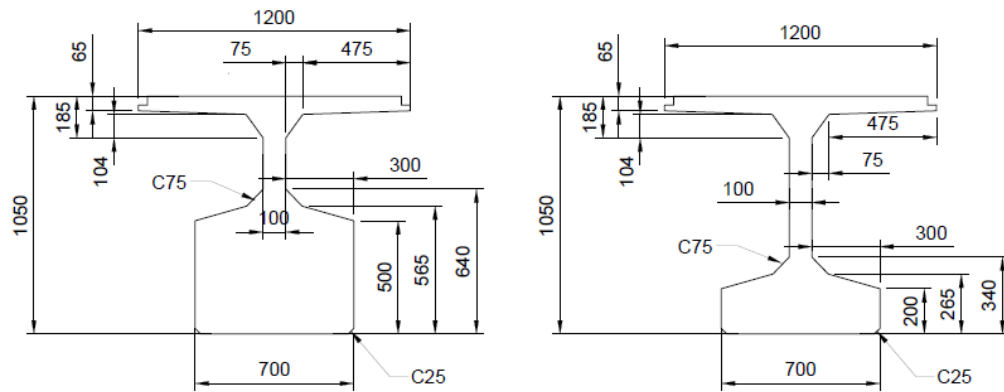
24 Girder section of 25m span UHPFRC post tensioned I girder at support and mid span
